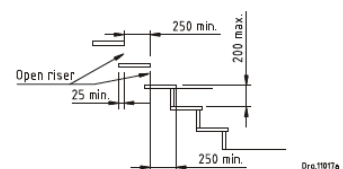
Stair detail (SANS Part M, 2011:9)
